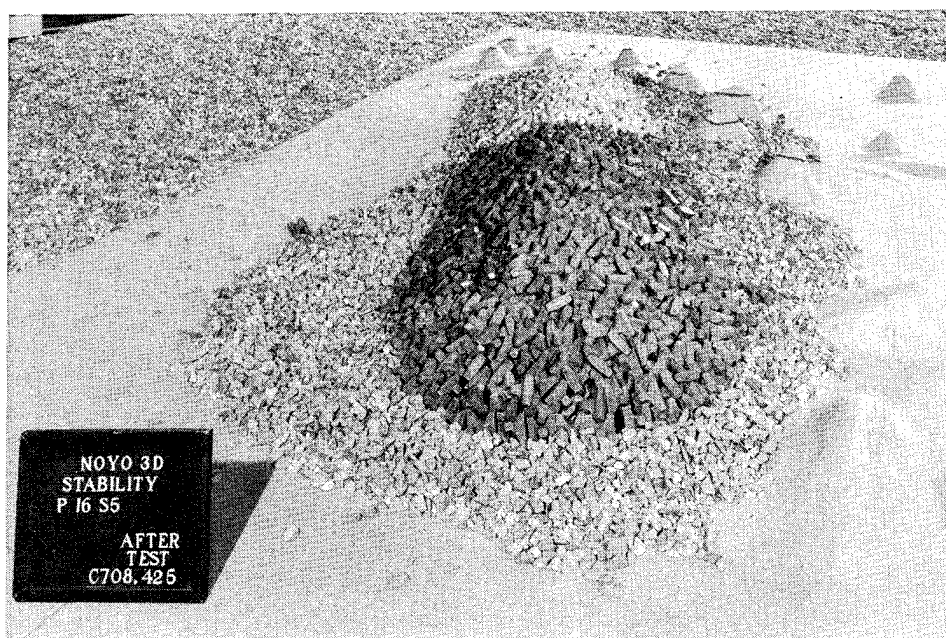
Plan 16, north roundhead after five series of modified Storm IB waves
